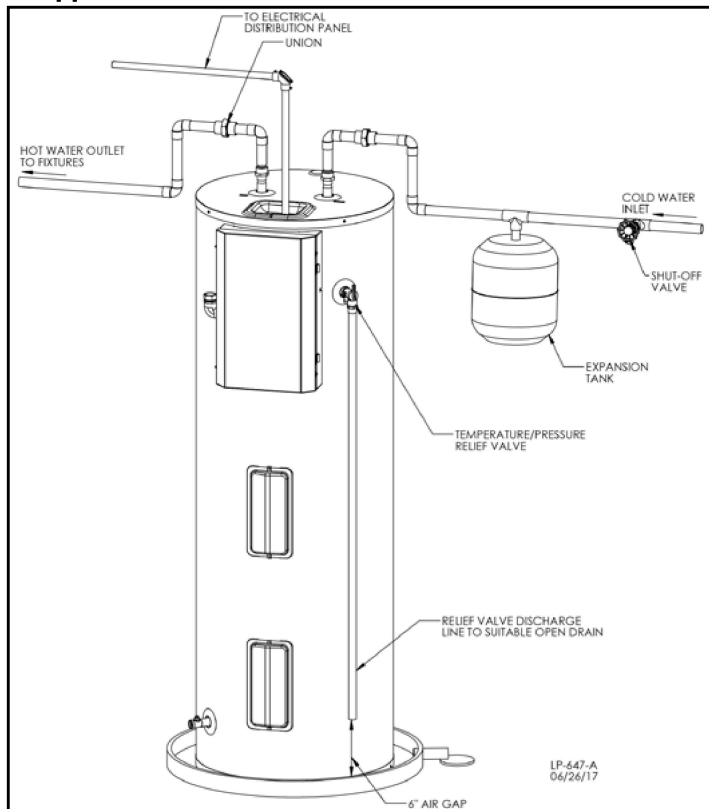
Piping Detail - NOTE: Drawing is meant to demonstrate system piping concept. Heat traps are optional.
